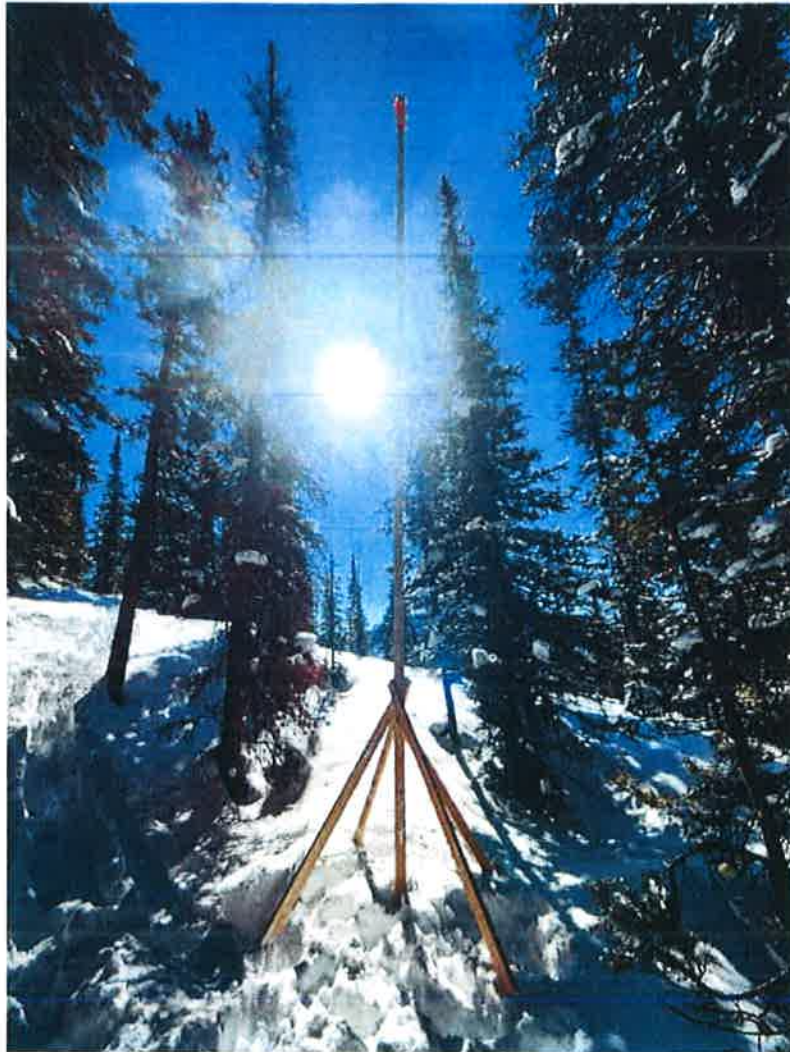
The location of the proposed building location, marked with the 30' story pole.
